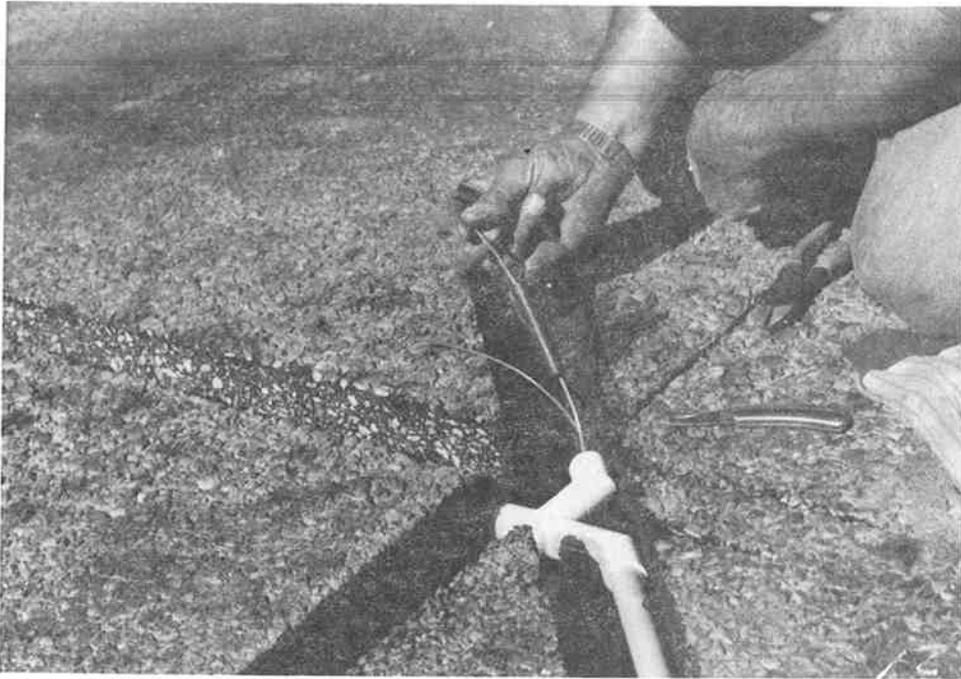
The old pavement is badly cracked and broken. It became necessary to dry the saw cut and the adjacent area with a gas torch.
